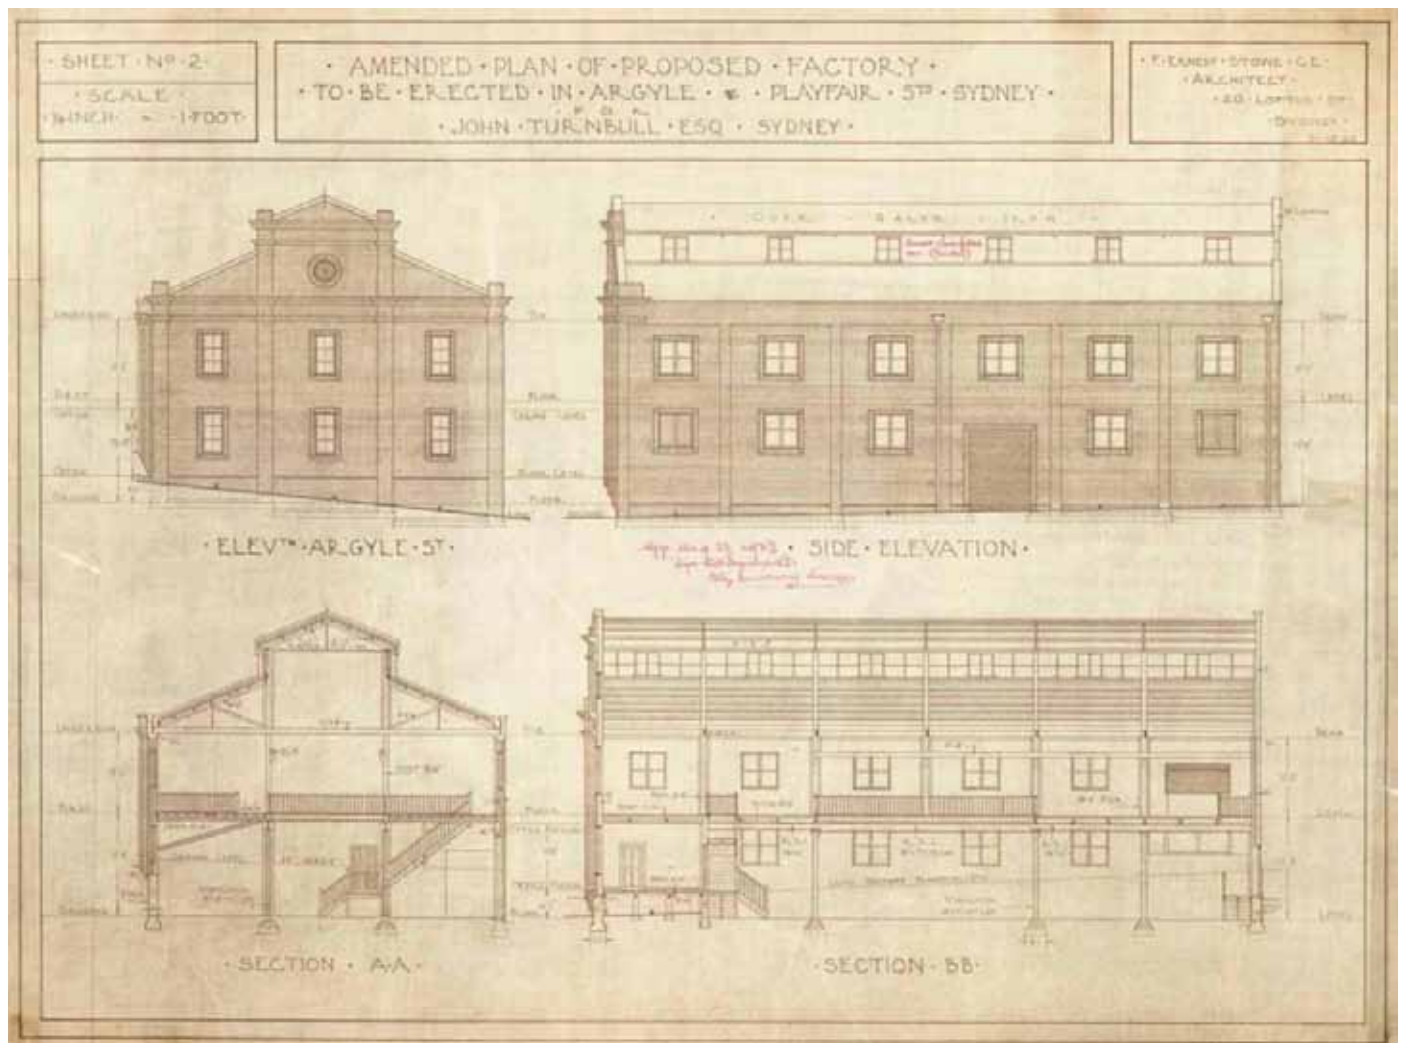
Building application drawing for Turnbull's workshops. Source: Building Application plan 0658/23, City of Sydney Archives
